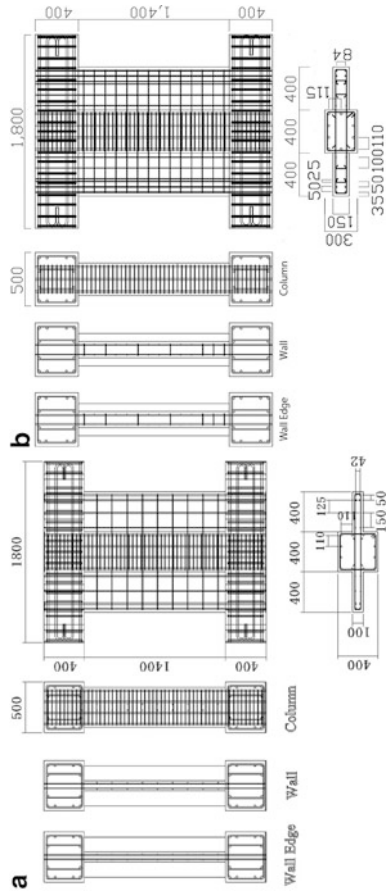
Test specimens of columns with wing walls (a) SWF1 and SWF2 (b) SWF3 and SWF4
